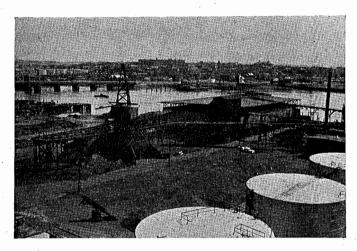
PHOTOGRAPH SHOWING PROPOSED SITE.
